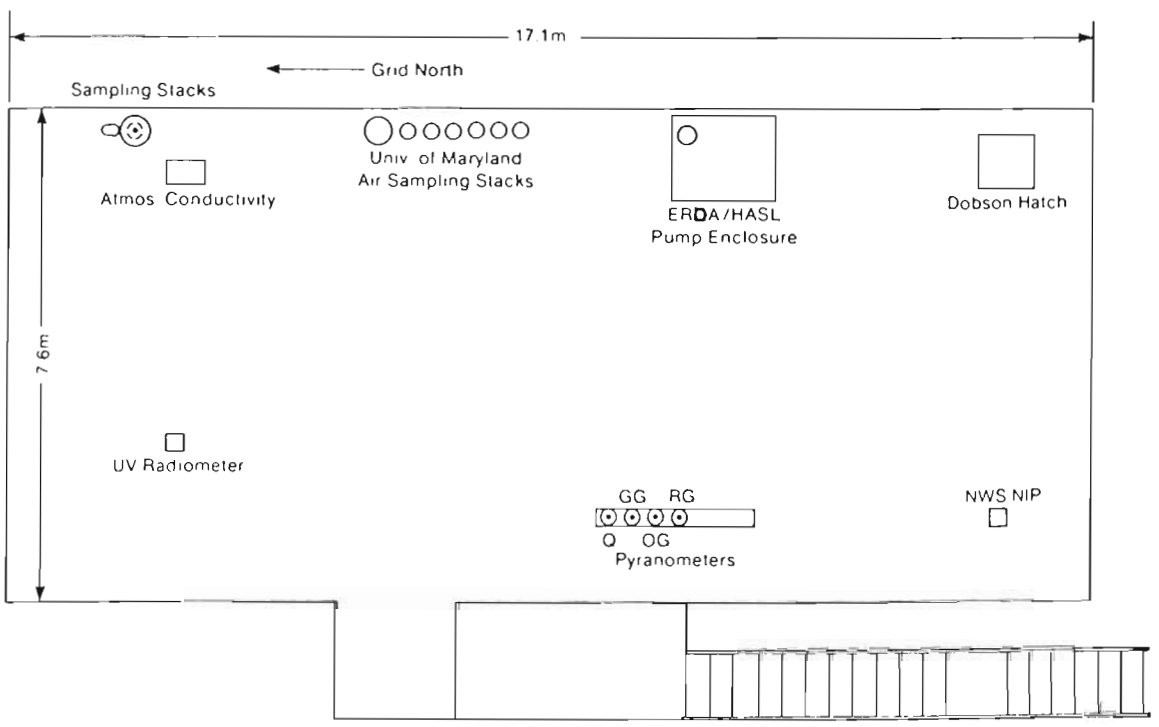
Roof plan of new CAF, South Pole, Antarctica, 1978.
